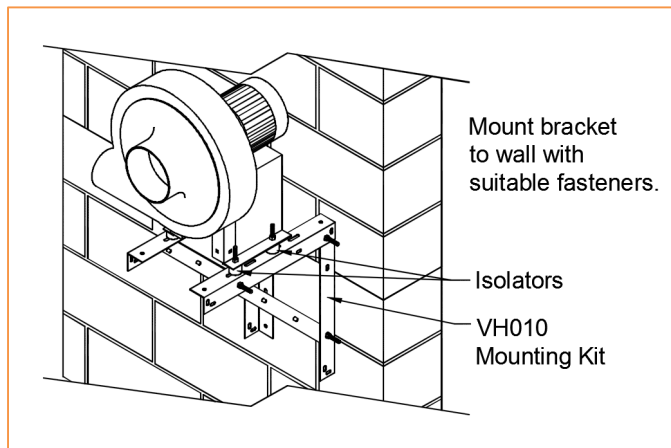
Side Wall Mounting - Recommended Pump Suspension
